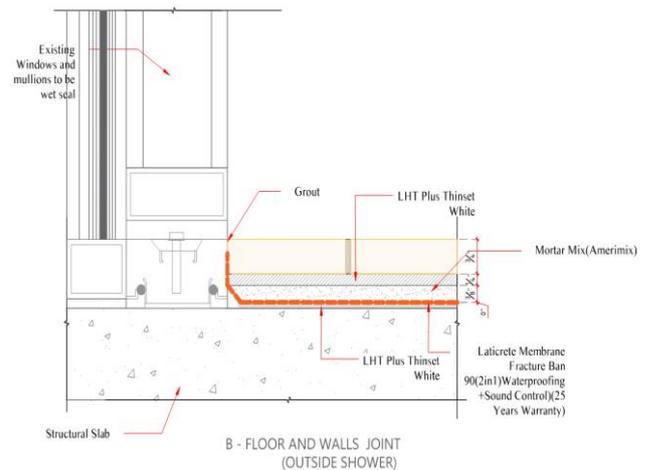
De-Identified Floor-To-Wall Transition Detail Showing Continuous Waterproofing Turned Up at the Wall Beneath the Tile Assembly to Maintain Wet-Area Containment at the Joint
